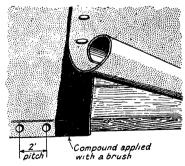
How Ruberoid down-ROOF SEAMS ARE NAILED AND CEMENTED
